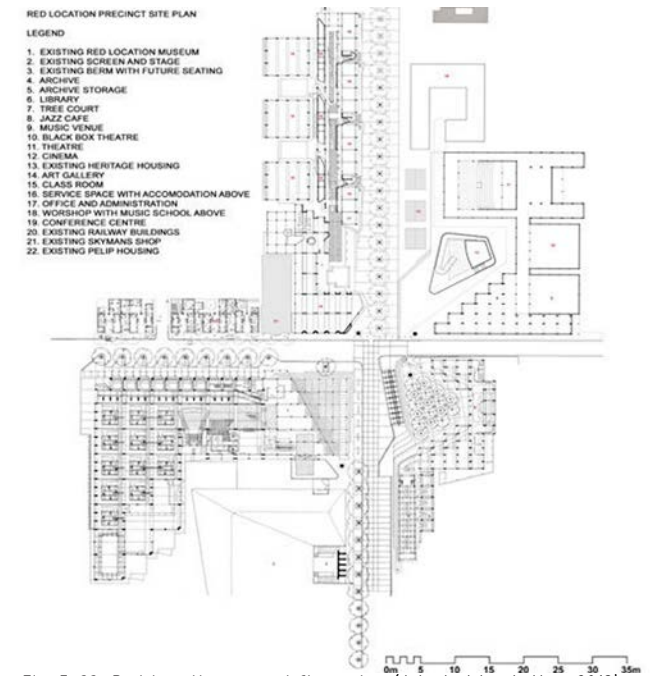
Red Location ground floor plan (Adopted by Author 2018)
